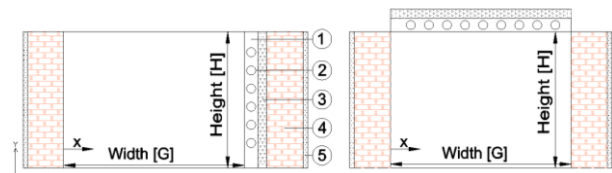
2D room model for wall-mounted (I) and ceiling radiant panel (II)
